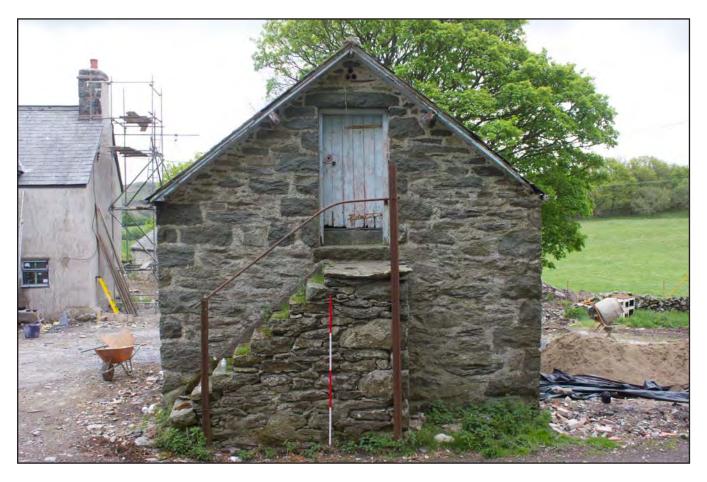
Northeast elevation of Building 2 - Horse/Pony Stable at Gaer Gerrig, Llangwm, Conwy - from the northeast - 2.00m scale
